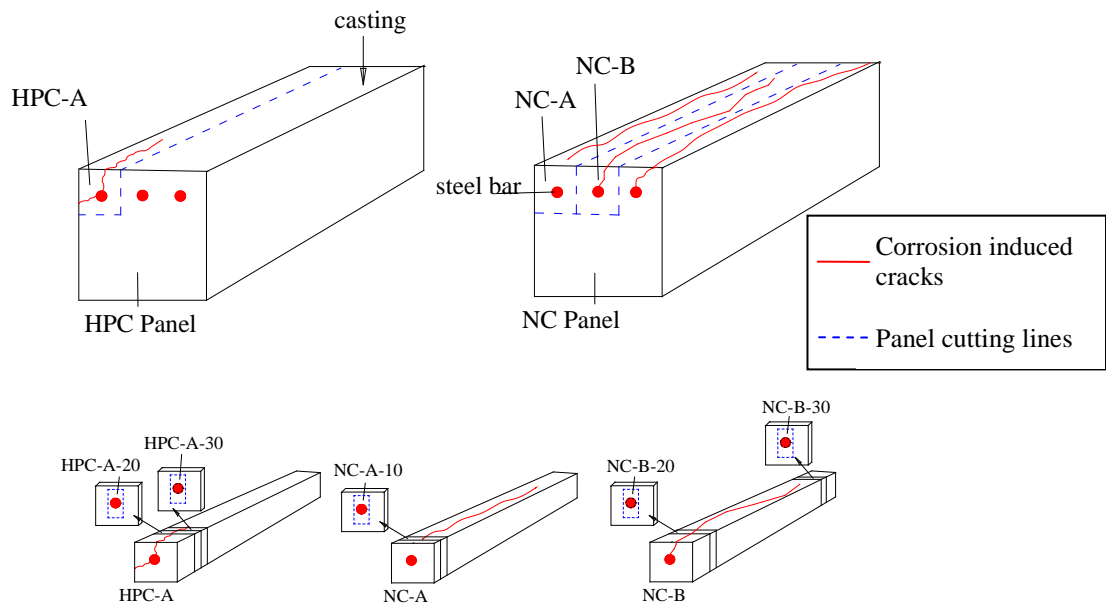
Schematics showing the sectioned concrete panels and locations of the 8mm thick slices.
